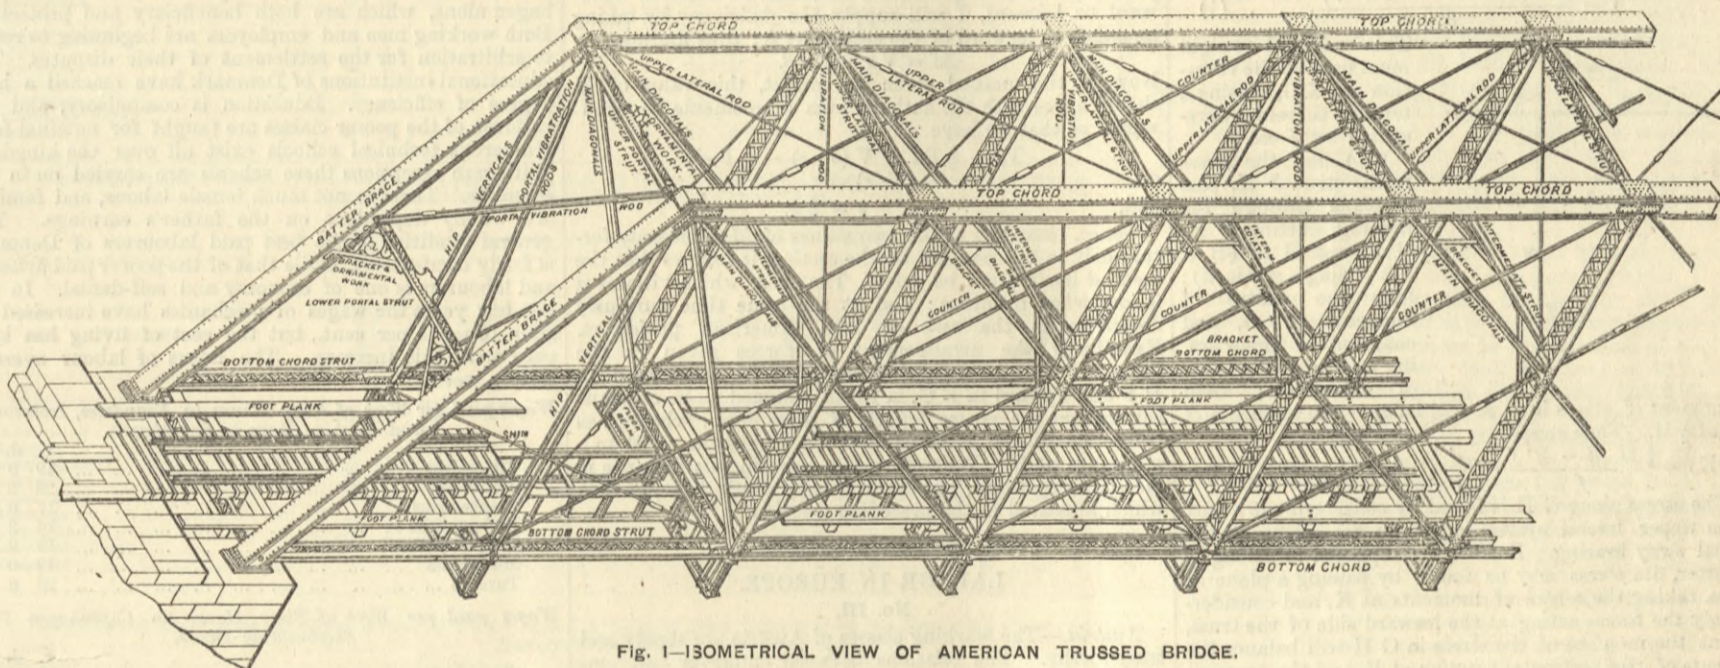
ISOMETRICAL VIEW OF AMERICAN TRUSSED BRIDGE.
